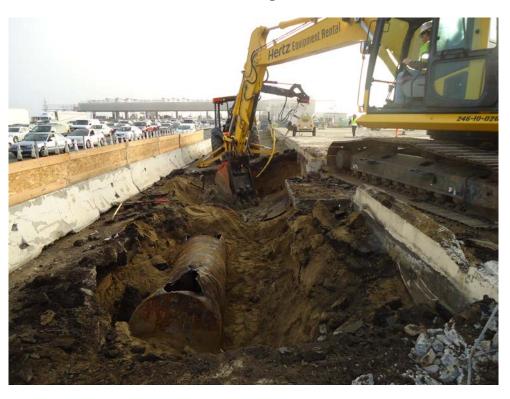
View of the top of UST #2 after the ends of the tank were further opened using a rivet buster.
